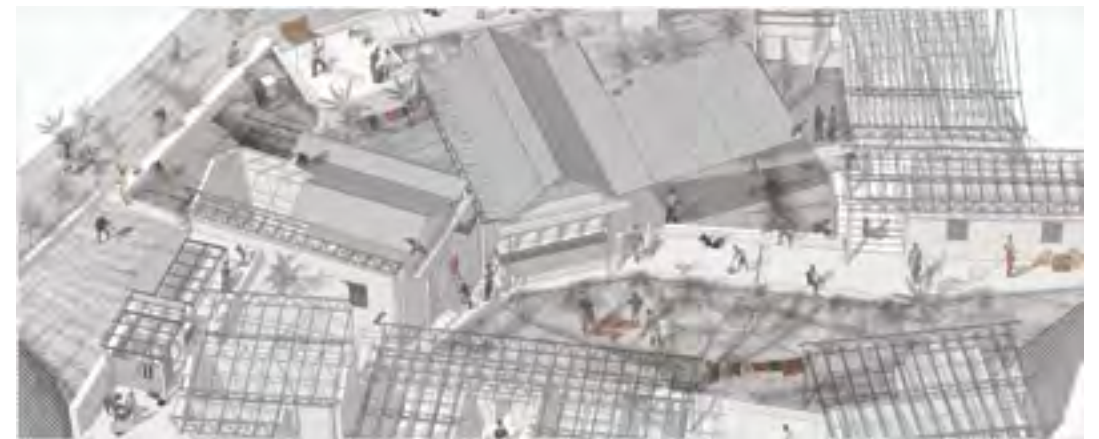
Constructing the Zongo – phase 2 > trash collected, new roofs being constructed, weirs thickened to accommodate human activity, ridges and edges added, more vegetation and fertile soil.
